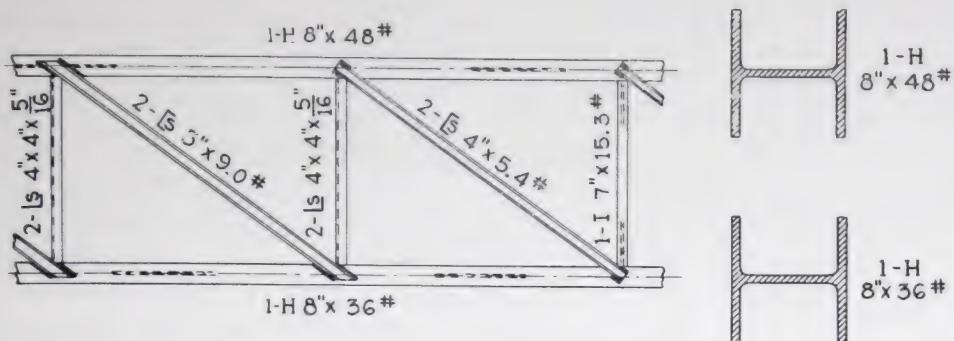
Typical Arc-welded Pratt-type Truss
